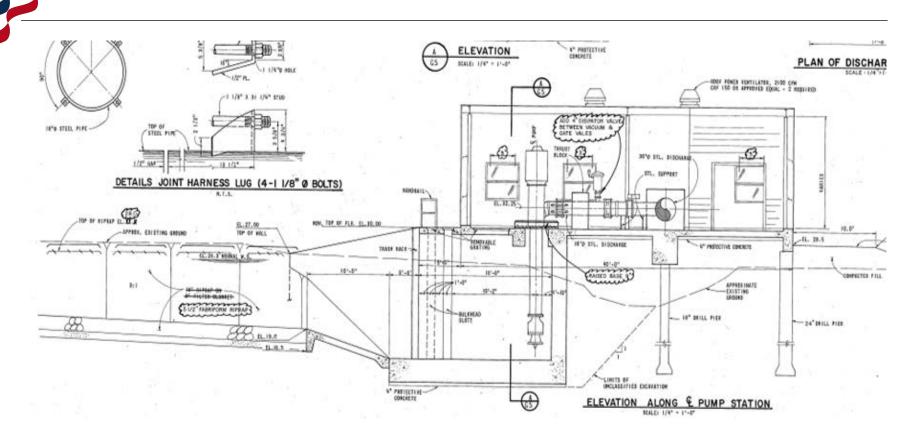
Elevation Drawing of GBRA Calhoun Canal Pump Lift Station
